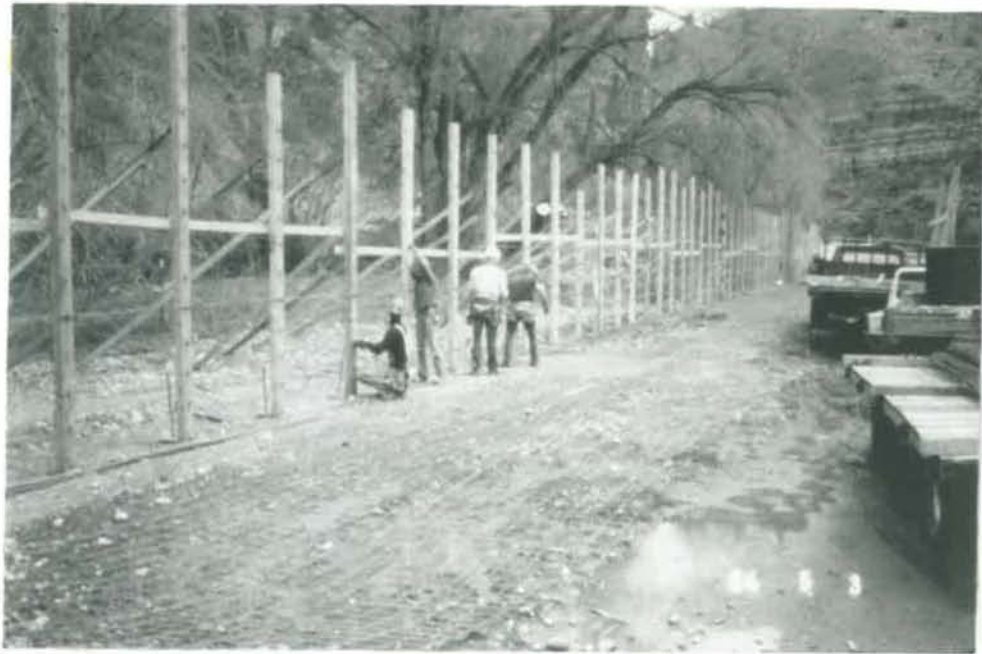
SETTING UP THE TEMPORARY FACING BY INSTALLING WIRE MESH ON THE WOODEN FRAME
